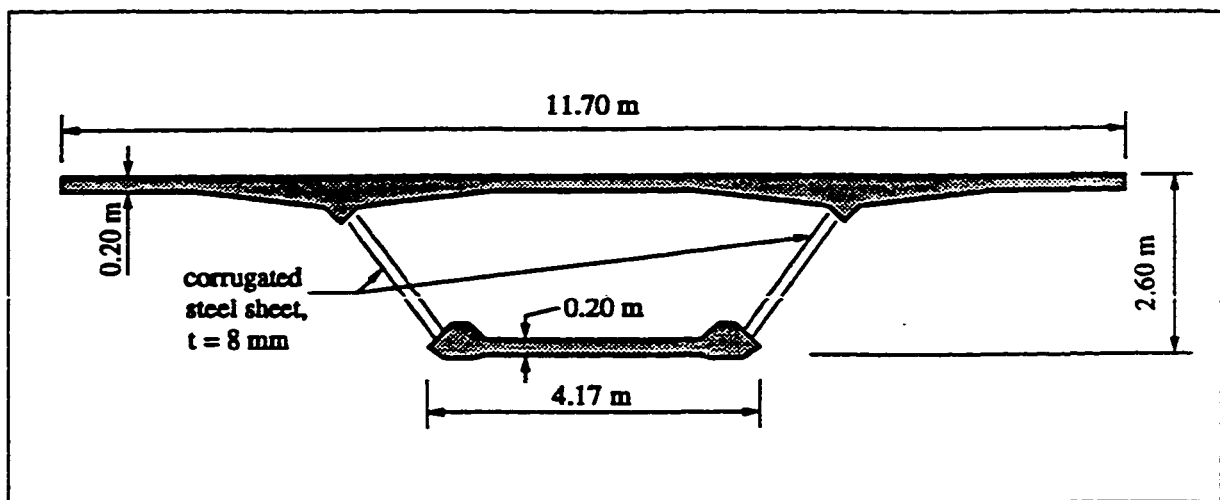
Cognac bridge - Typical mid-span cross section, [ref. 6,20]
